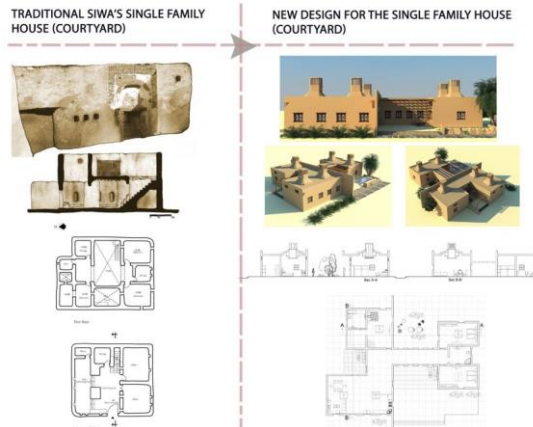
Traditional Siwa house design & new plan design for single family house prototype (Researcher).
